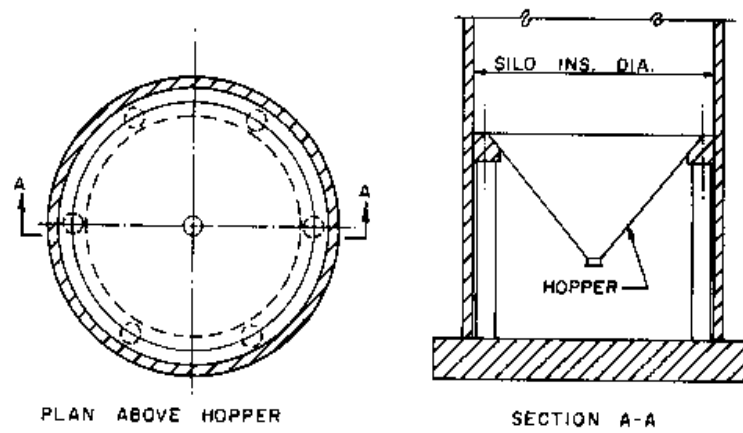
Silo bottom hopper supported on concrete ring beam and column system
